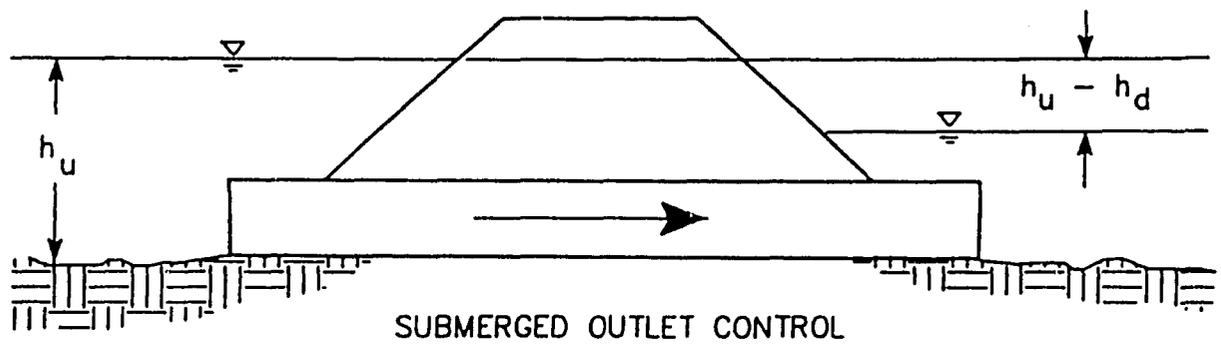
Outlet Control Flow Conditions For a Culvert.
